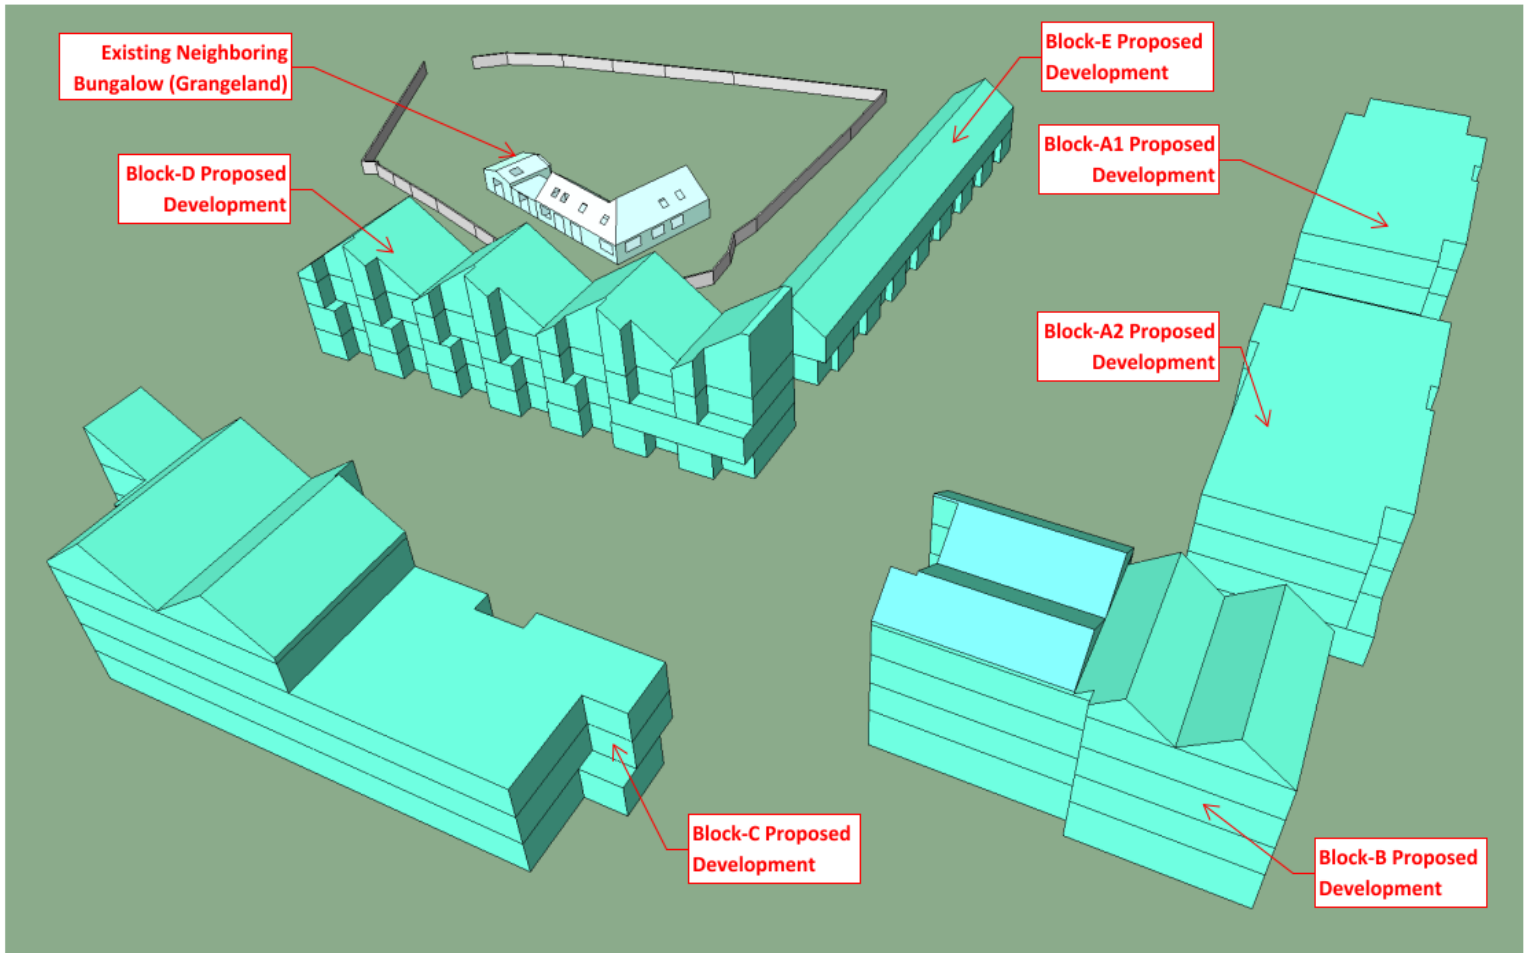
3D Model of Proposed Cherrywood development and adjacent building
